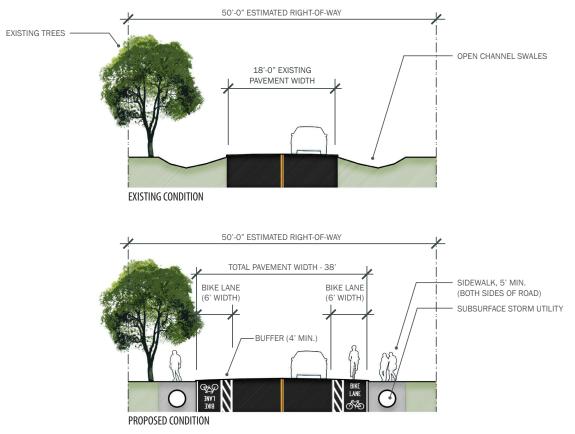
Cross-section study of existing and proposed conditions of typical corridor with 50' right-of-way
